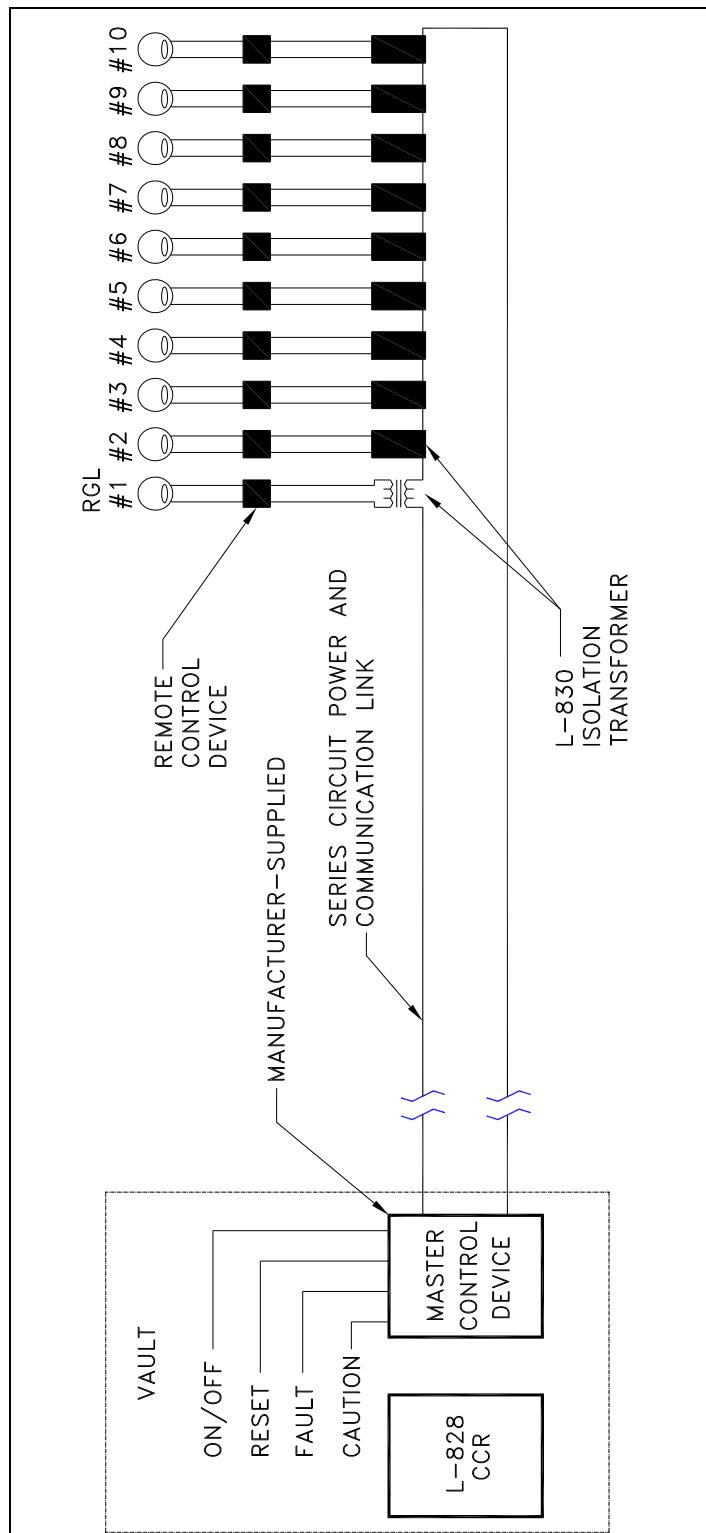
Typical In-Pavement RGL External Wiring Diagram – Power Line Carrier Communication, One Light Per Remote.
